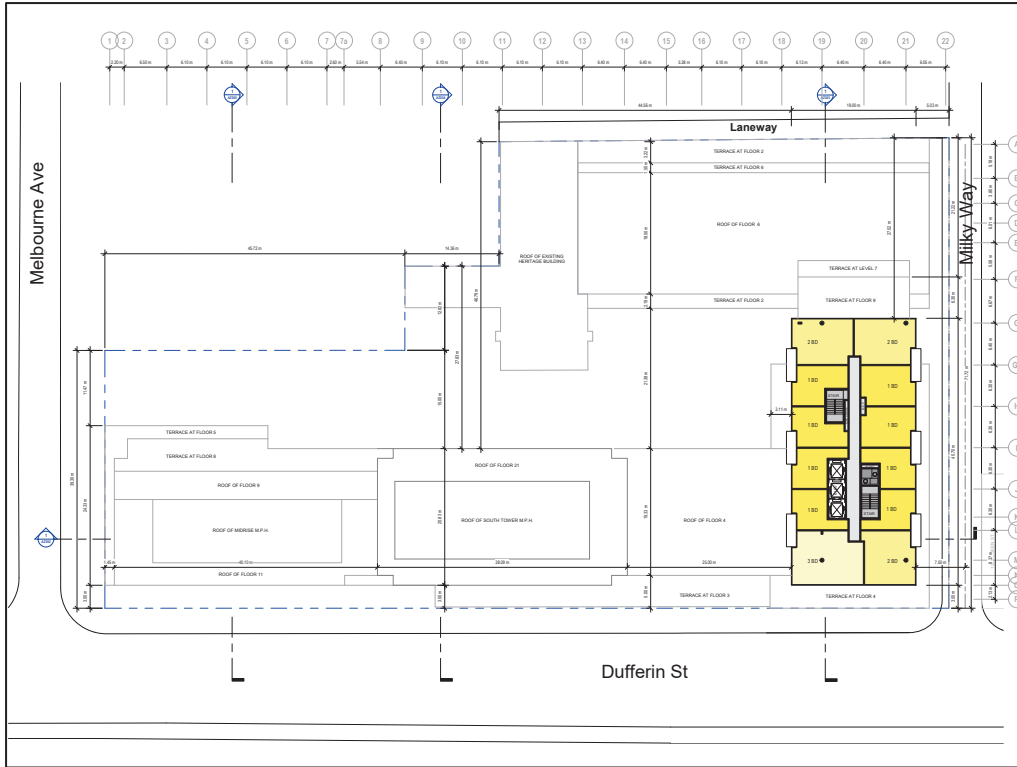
23rd – 25th Floor Plan (Sweeny & Co)
